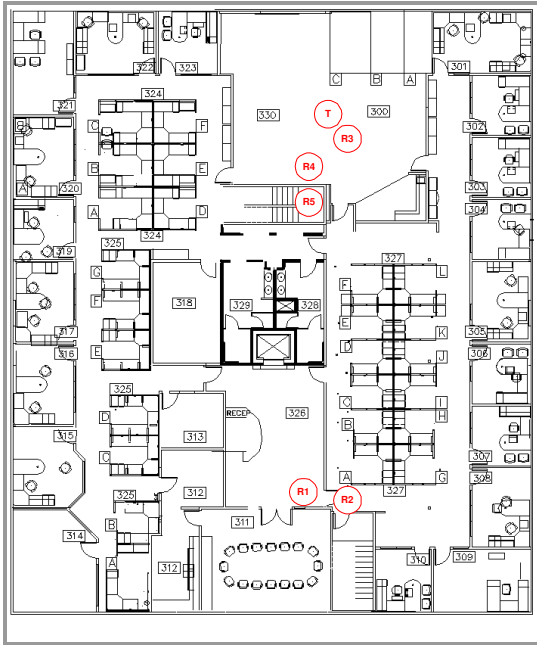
Floor Plan for Magis 3rd Floor (Maximum Length Dimension Approx. 110 Feet)
